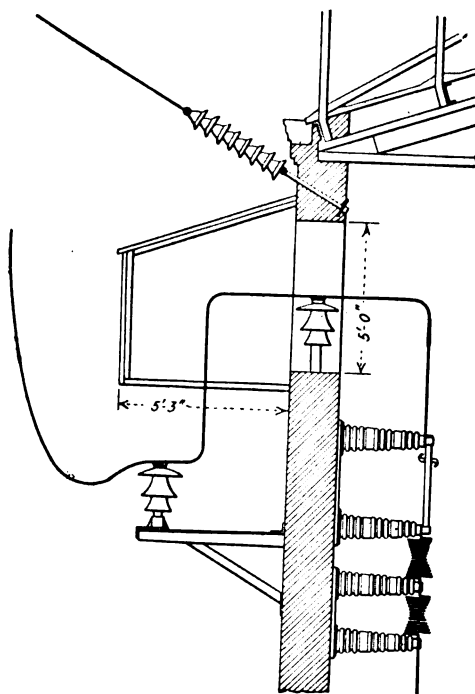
MEXICAN LIGHT AND POWER CO., LTD. ARRANGEMENT OF OUTLET FOR LINE FOR 85,000 VOLTS AT NECAXA POWER HOUSE NO. 1
